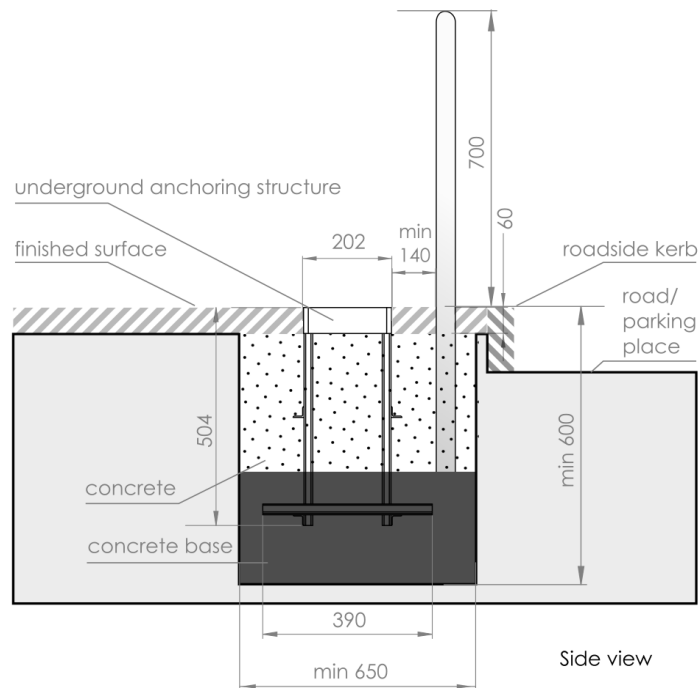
Transversal section of the excavation and safety arches on the kerb with one safety arch
